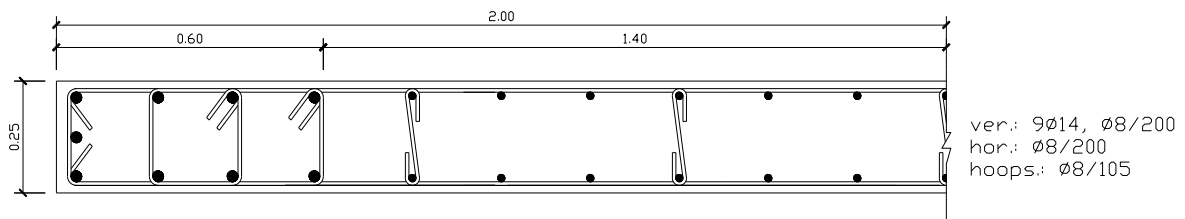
Longitudinal reinforcement of wall W3
